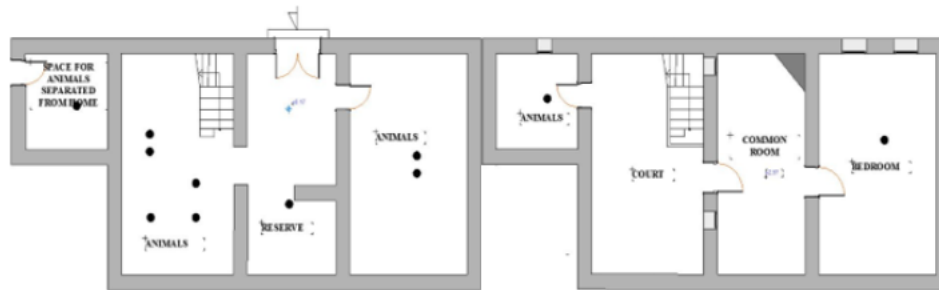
Ground Floor Plan (left) and First Floor Plan (right) prior to Rehabilitation
